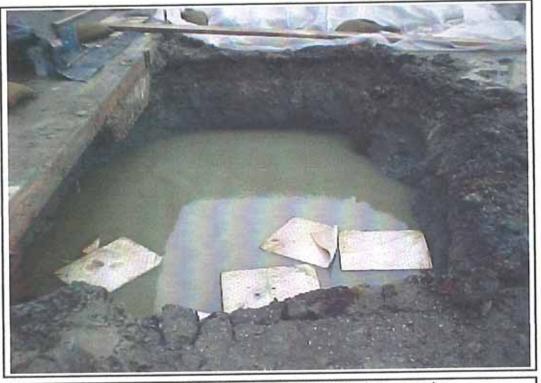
Tank excavation full of water, March 13, 2002, prior to pumping.
